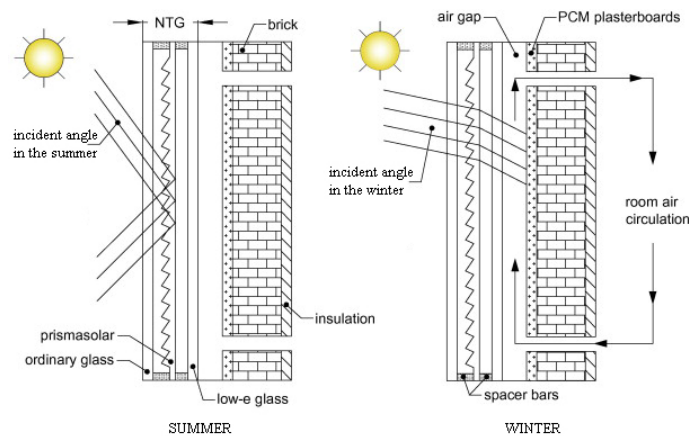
Cross section of the PCM wall scheme [adapted from [29]]
